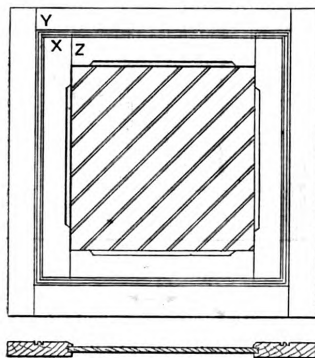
Combined Door and Frame and Longitudinal Section Through Panel.
